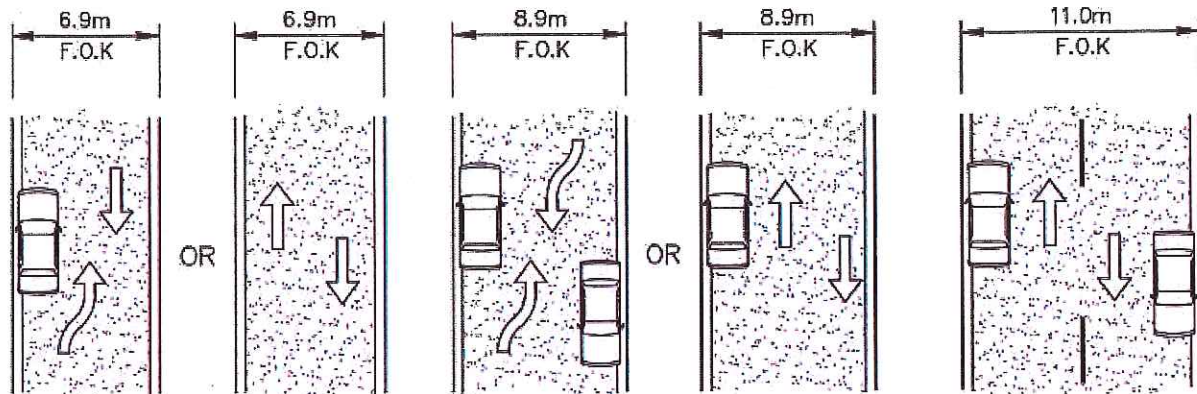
Typical Carriageway Forms (Source: LGAT Standard Drawing TSD – R06 – v1)
